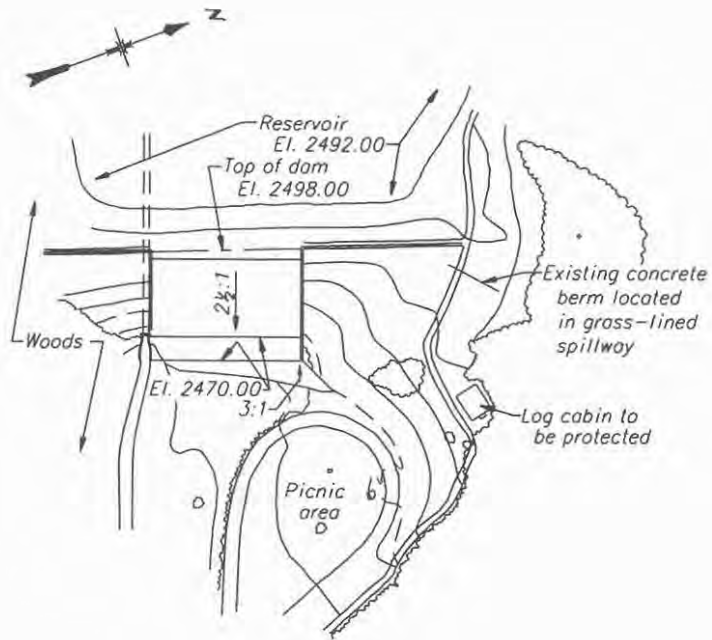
General plan of the block spillway layout on the 27-ft-high embankment dam with 2.5:1 downstream slope.
